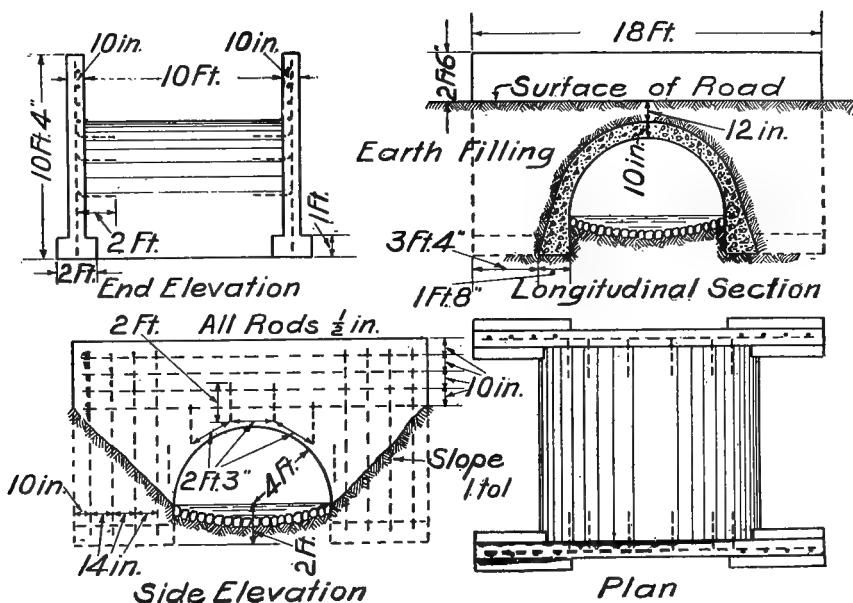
ARCH CULVERT FOR EIGHT-FOOT SPAN.
